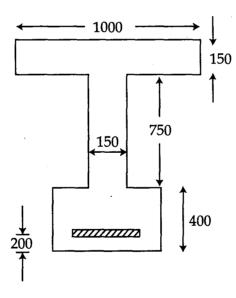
(All dimensions are in mm. The sketch is not to scale)
